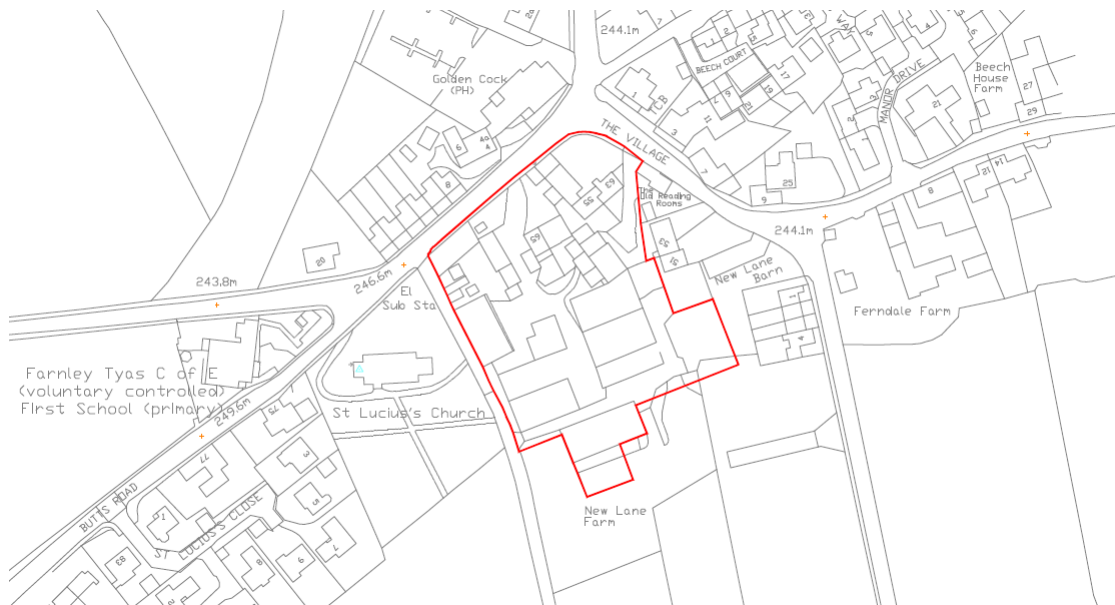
Site location plan, showing the site outlined red within Farnley Tyas
